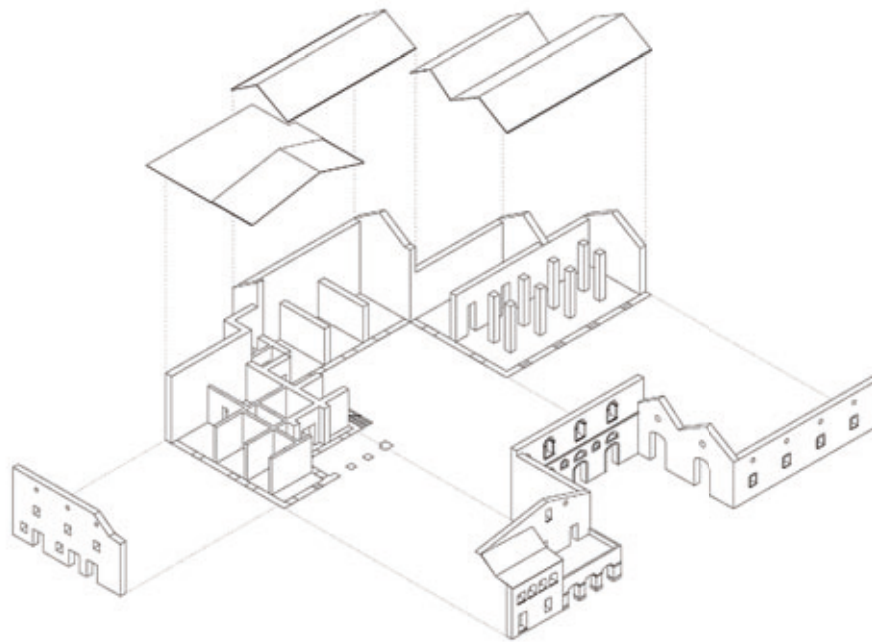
Exploded axonometric view of Farina Farm (Battipaglia)
